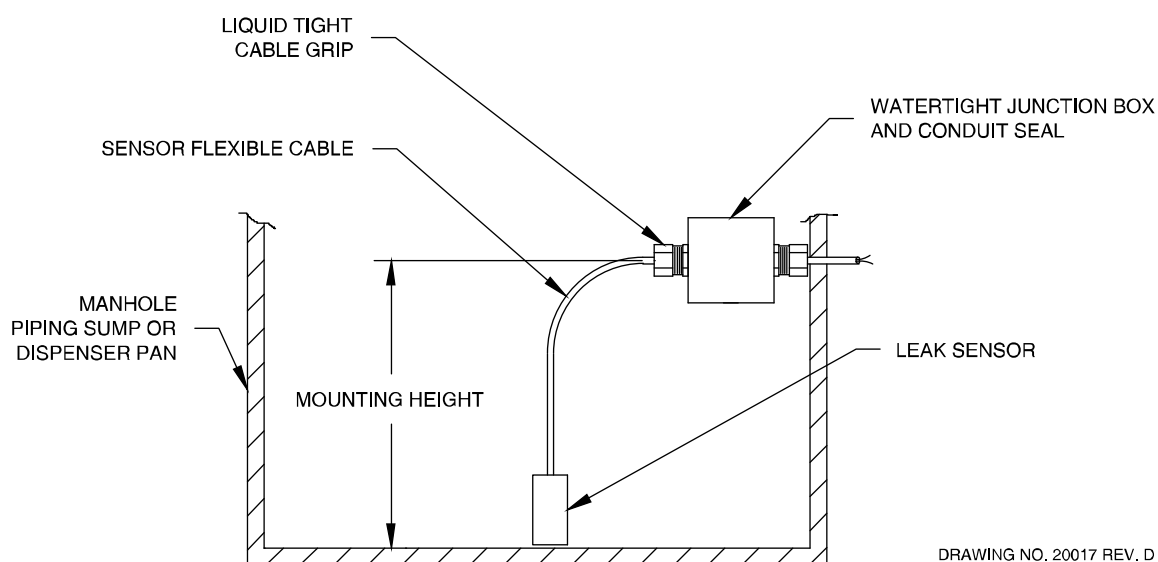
Leak Sensor Installation in Piping Sumps, Manholes, and Dispenser Pans
